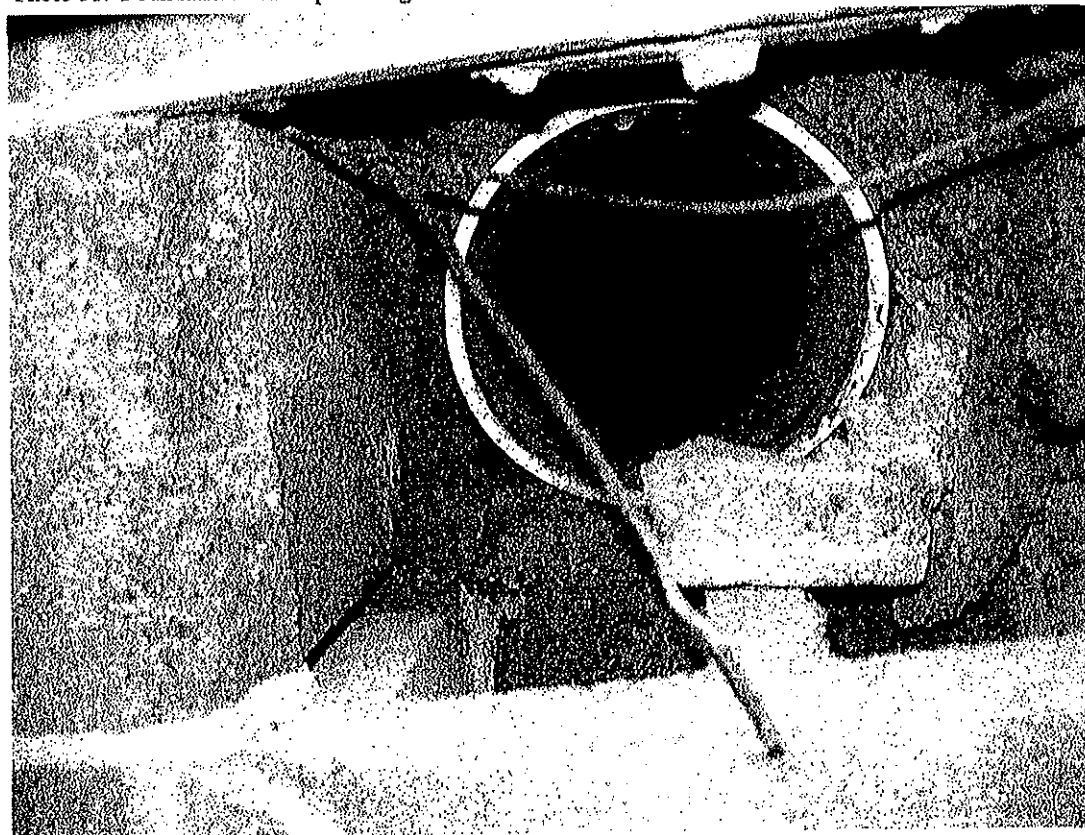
Close-up View of Vent Pipe Showing it Barely Extending in through the Exterior Face of the Foundation Wall
